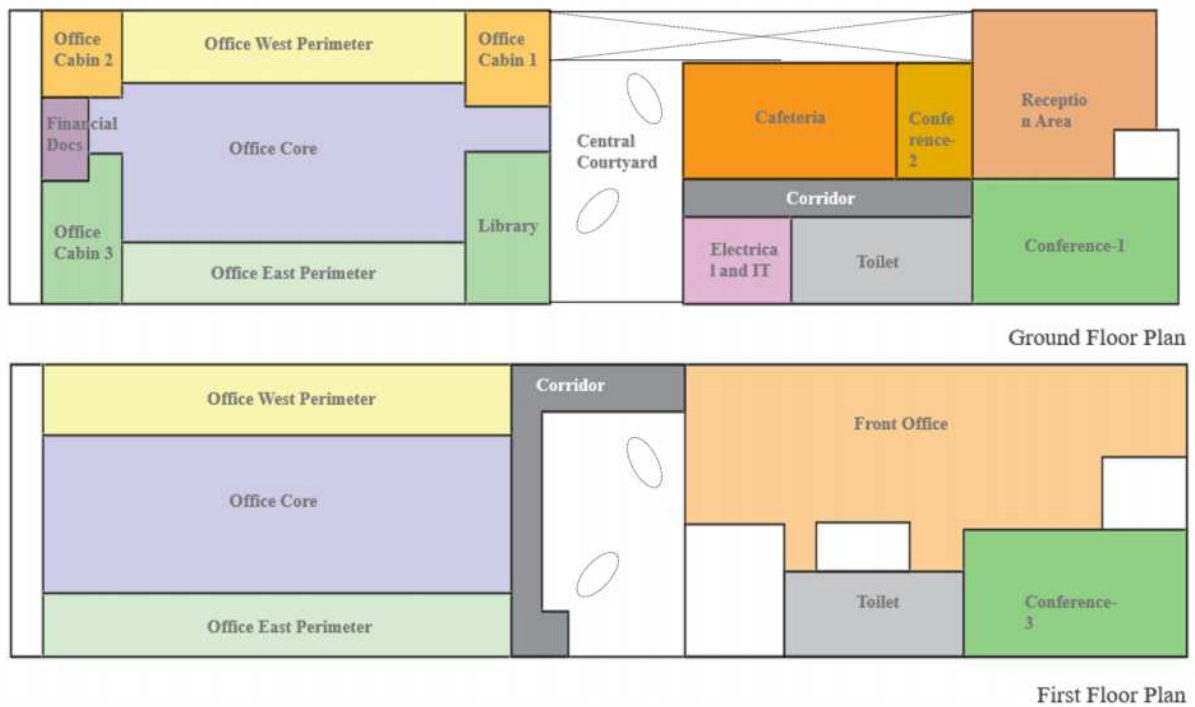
Ground Floor and First Floor Thermal Zoning Plan
